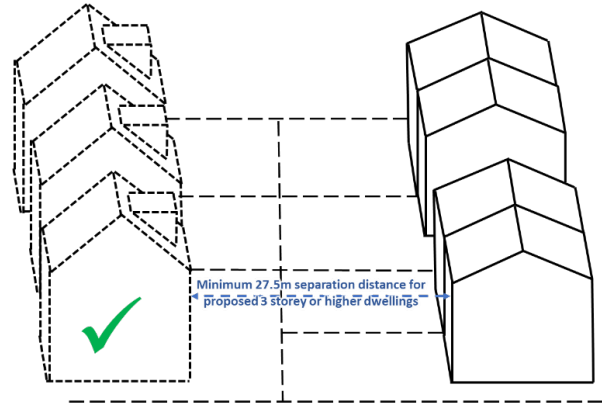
Separate Standard - Dwelling to Side of Another Building
